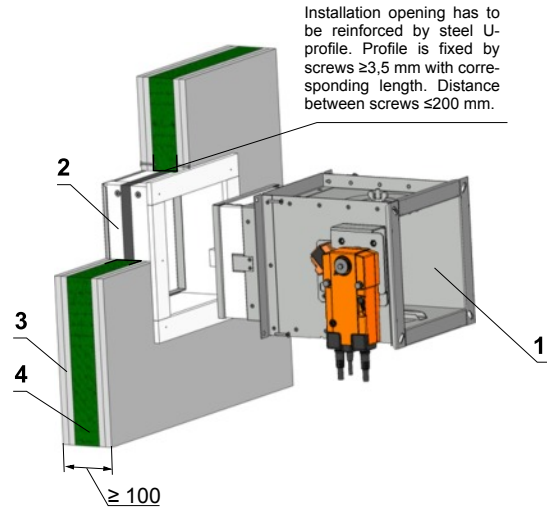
Gypsum wall construction - installation frame E1, E3, E4
